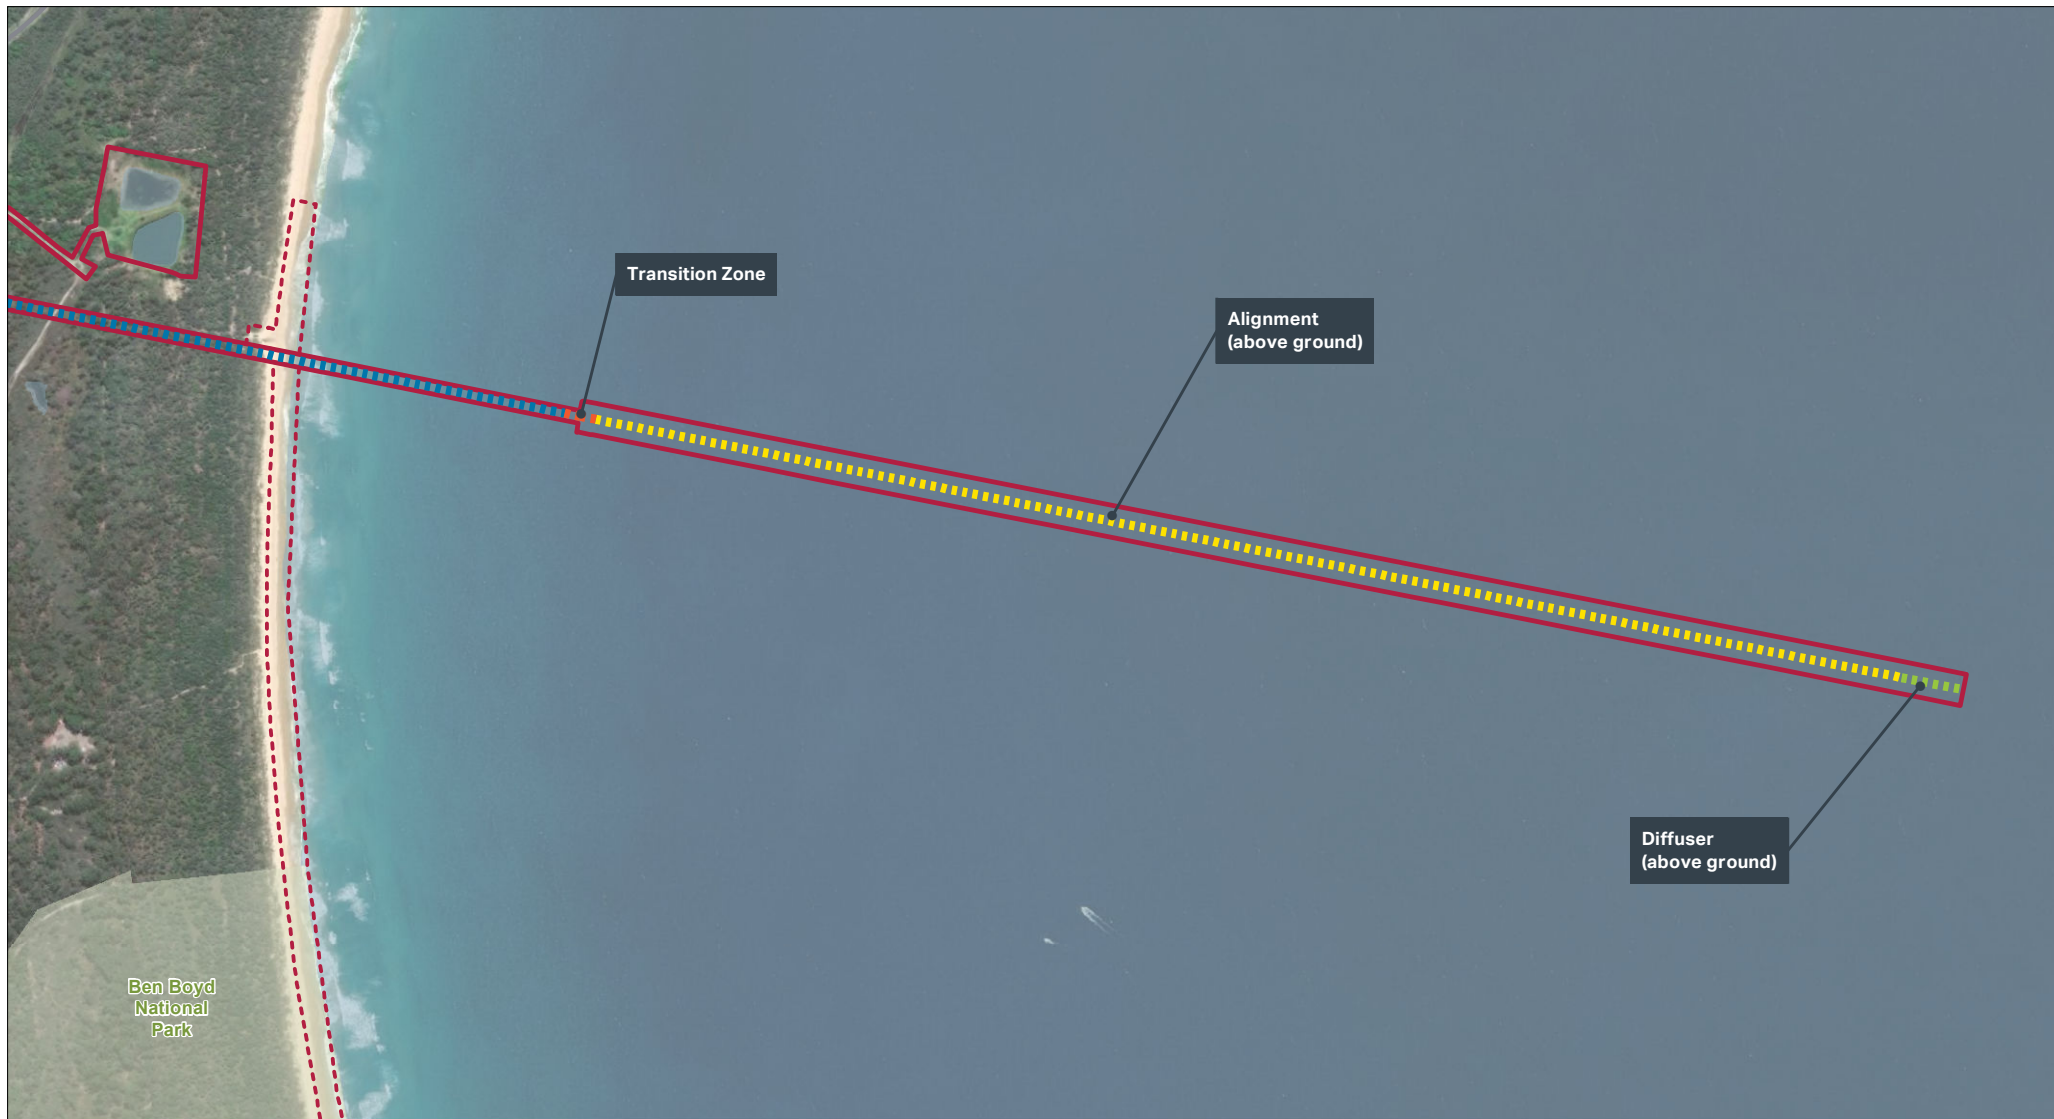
OCEAN OUTFALL PIPELINE – SECTION 2 (ABOVE SEAFLOOR)
